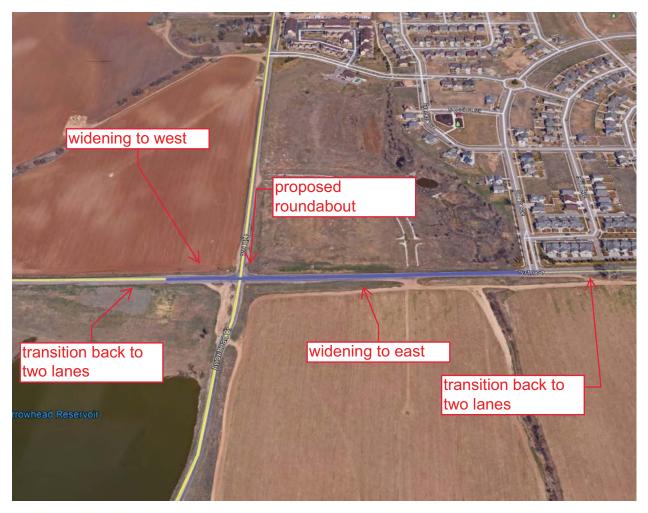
limits of 37th Street and 47th Avenue Roundabout and Widening
